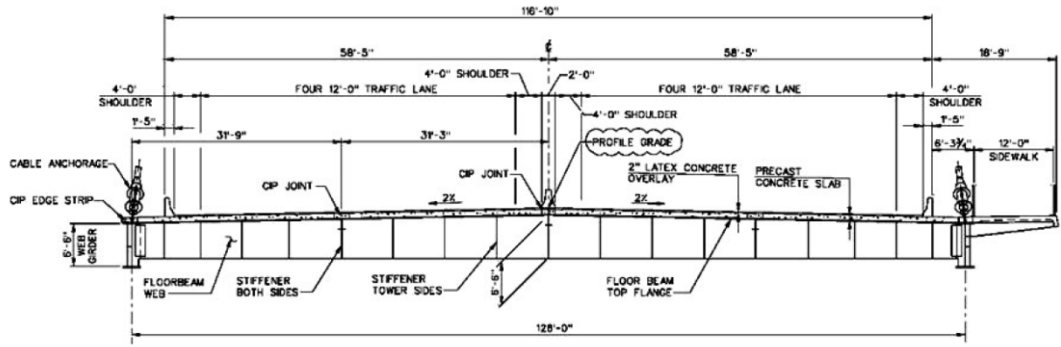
Typical Section for Main Span of Cooper River Bridge
